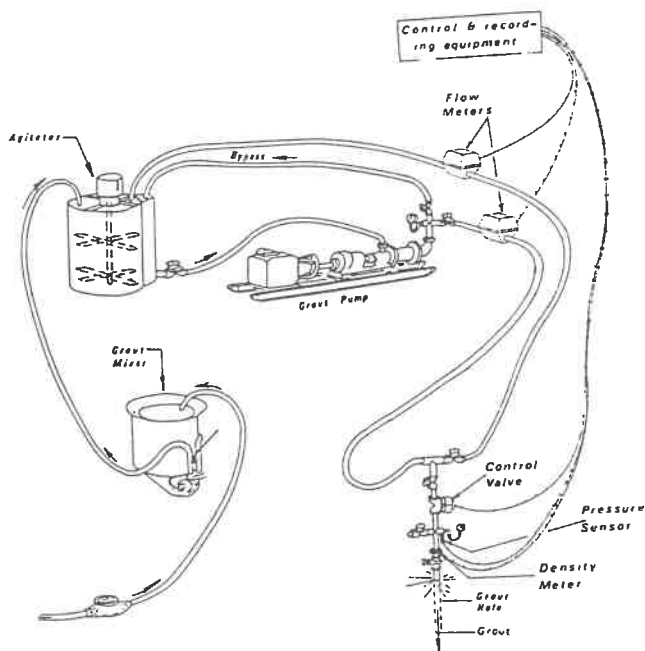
Typical configuration of grouting equipment for cement suspension (after Houlsby, 1992)
